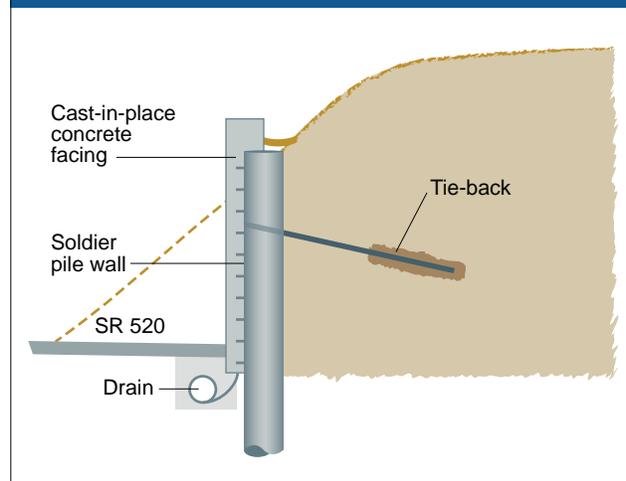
Example of a Soldier Pile Retaining Wall
